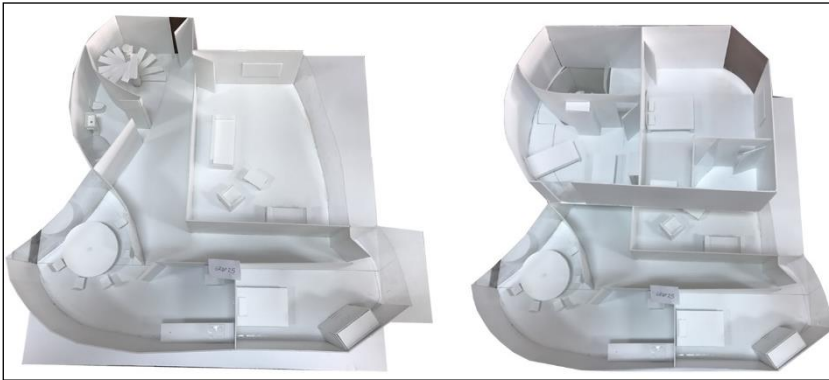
Top views of the example house for an extended family– Ground floor (left) and first floor (right)
